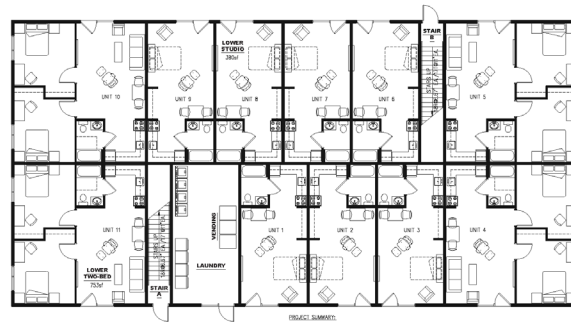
Staff Housing Expansion Apartment Floor Plan
